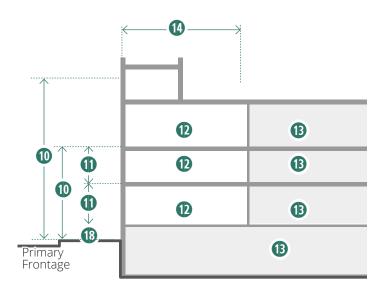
E-2. General Building: Height & Use Requirements
